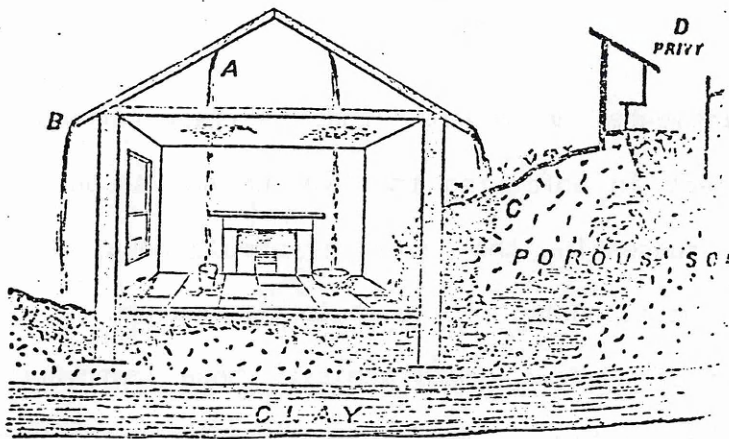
Cottage, damp from A, roof leaking into ceiling; B, unguttered eaves; C, outer wall, wet with soakings from garden and privy midden; D, privy midden above ground floor.
